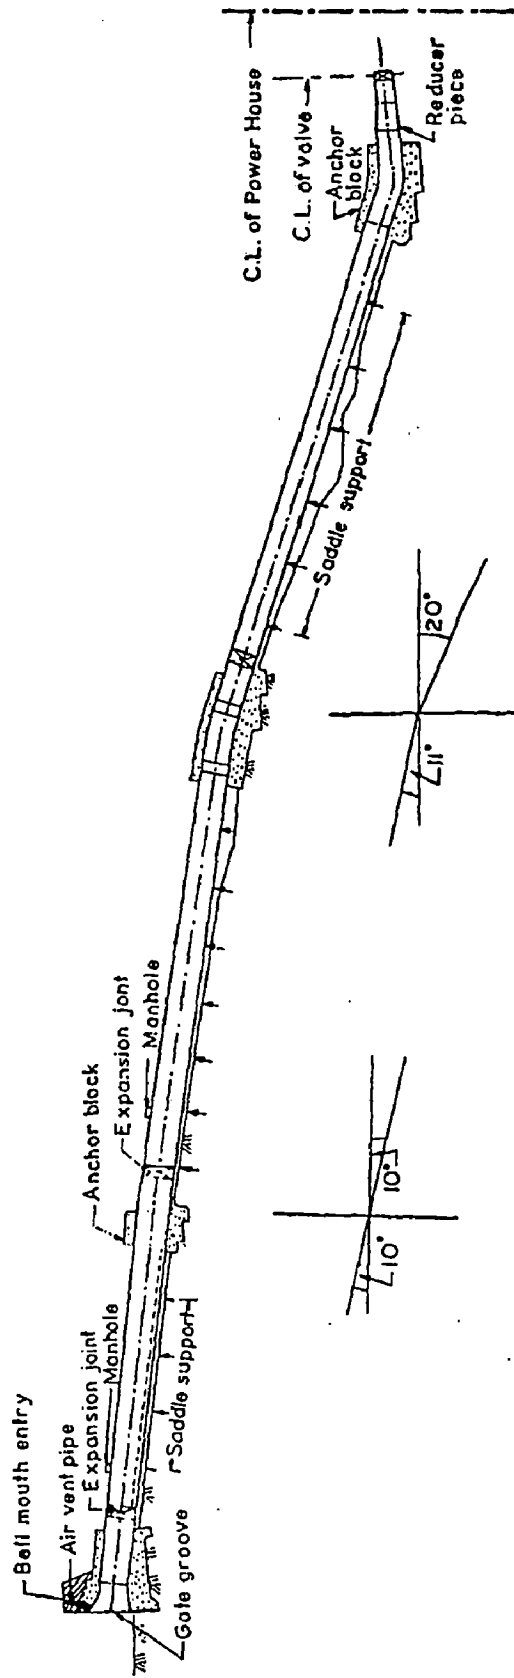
LONGITUDINAL SECTION OF EXPOSED PENSTOCK PROFILE
